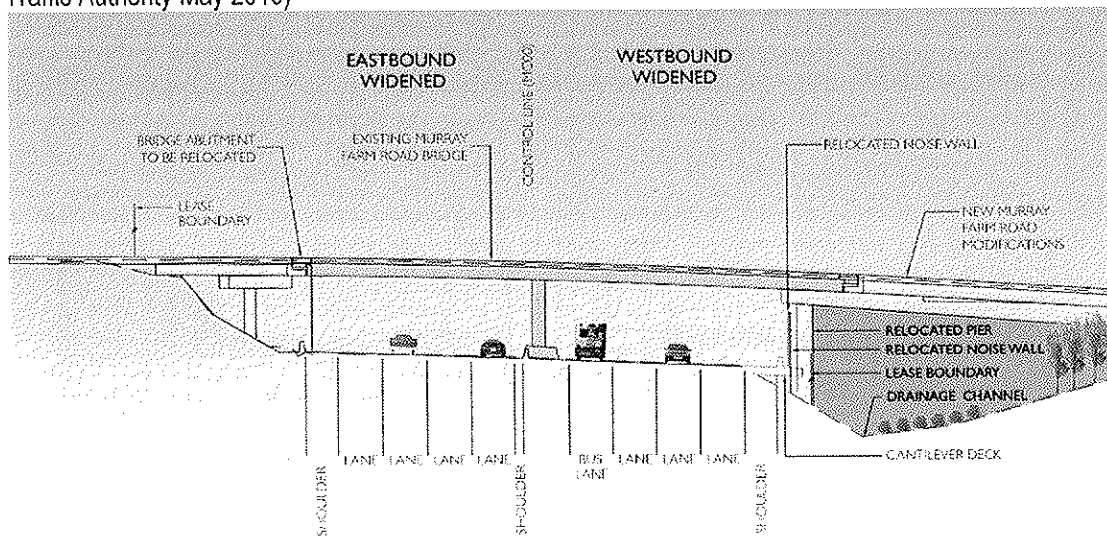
Typical Overbridge Structure (Source: *M2 Upgrade Environmental Assessment*, NSW Roads and Traffic Authority May 2010)
